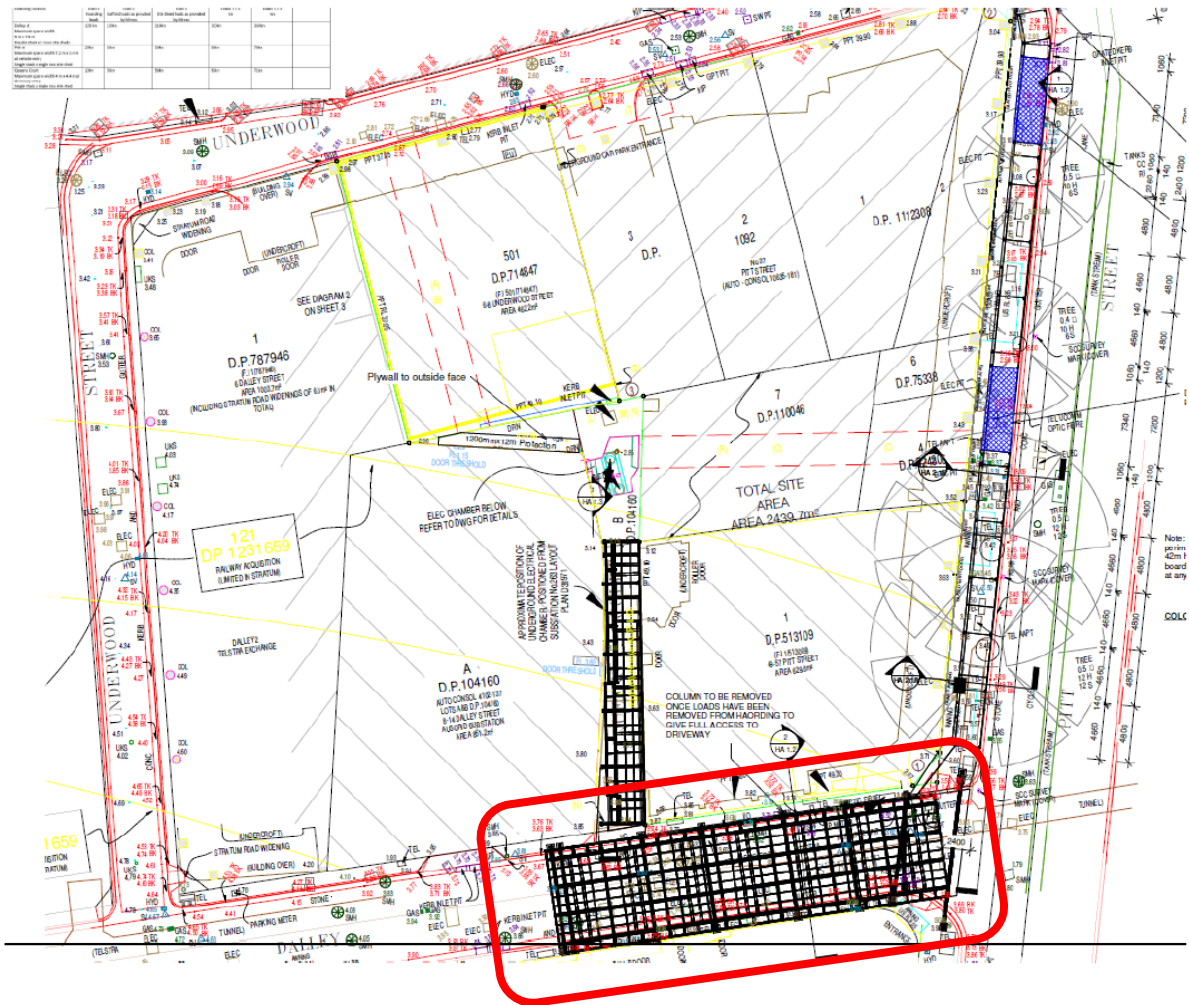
Proposed hoarding location plan. Hoarding located on Dalley Street circled in red.
